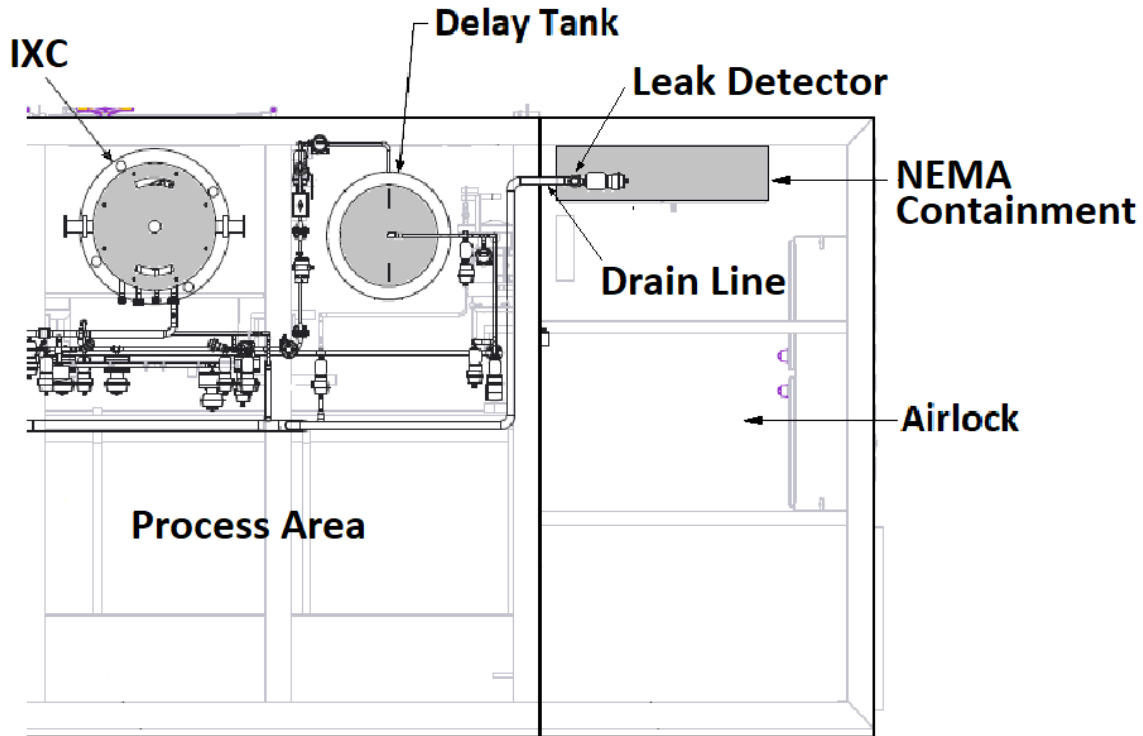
National Electrical Manufacturers Association Containment Cabinet
